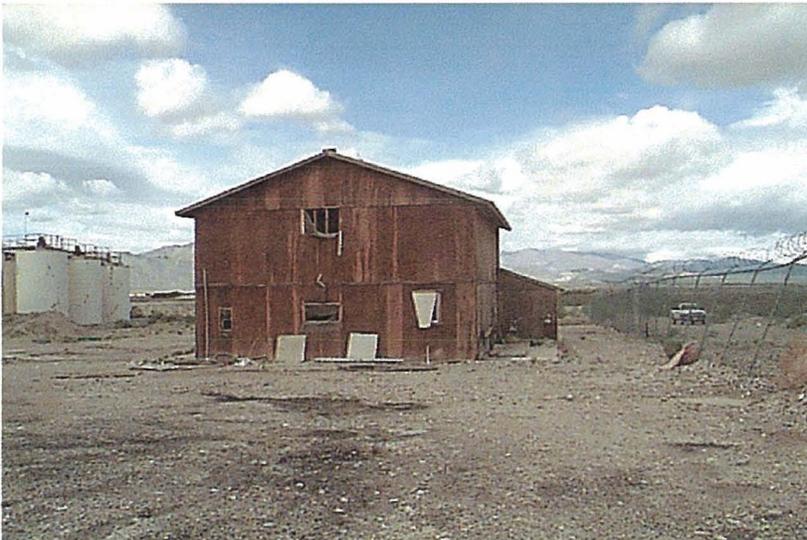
Taken by E. Seum on 4/18/00. Looking west at unsecured building on the Advance #4 mill site.
